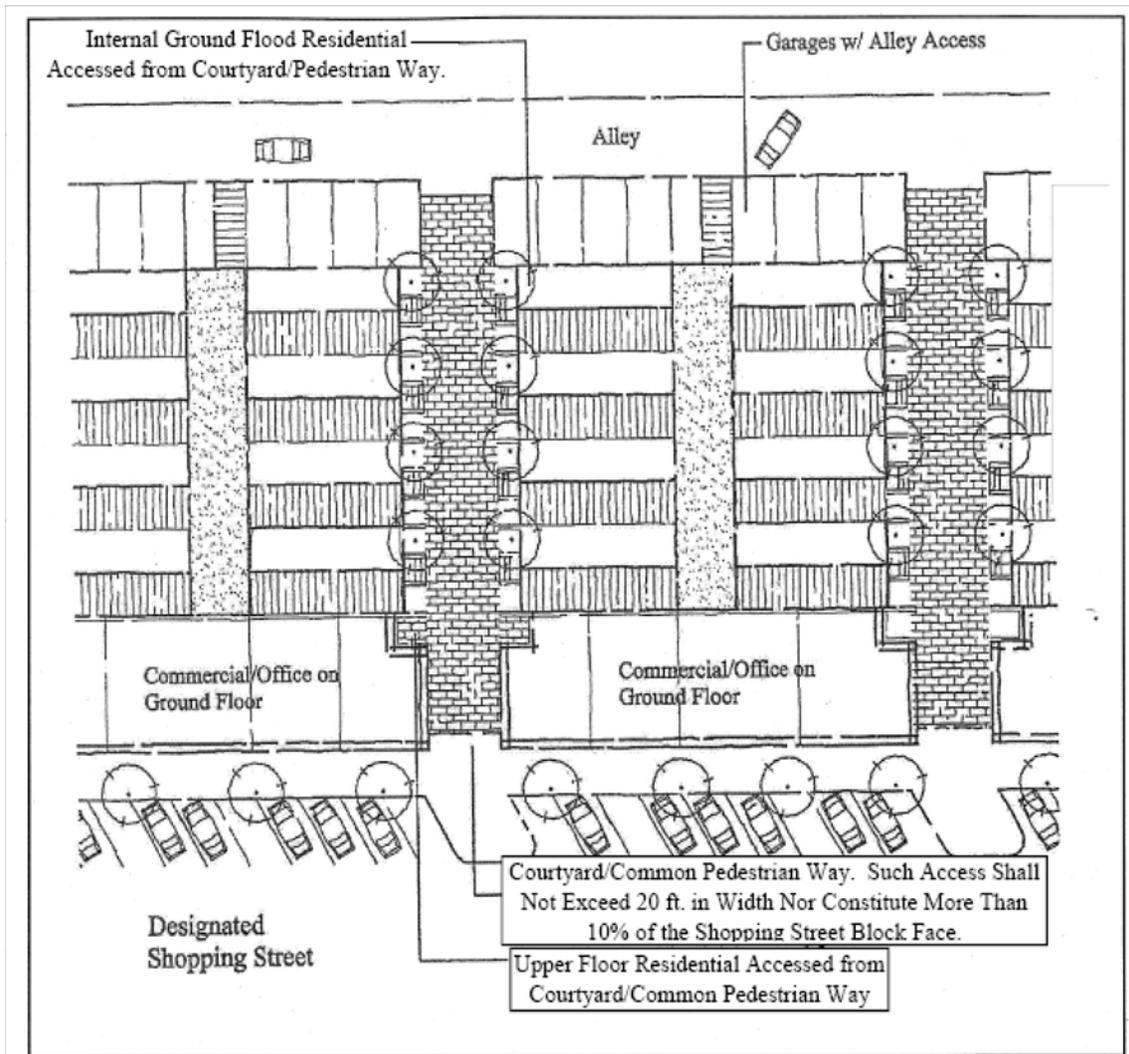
Location of Residential Dwelling Units in Relation to Shopping Street
